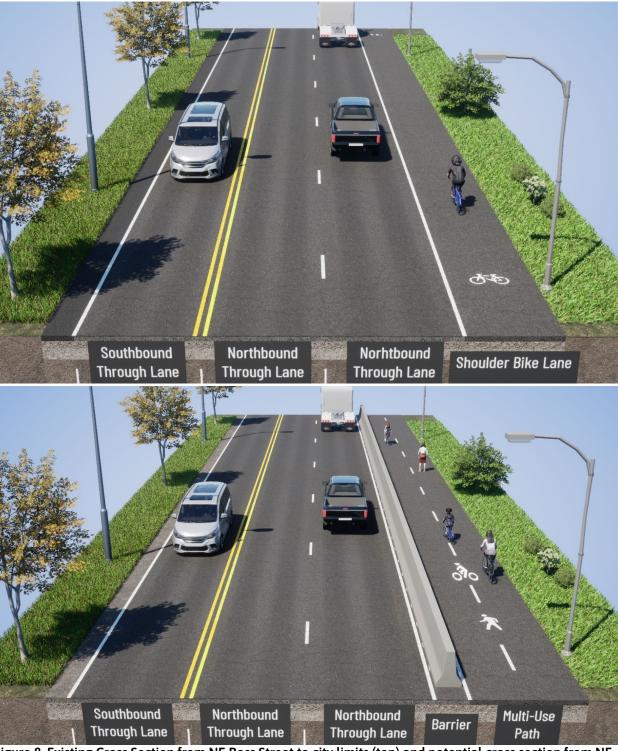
Existing Cross Section from NE Ross Street to city limits (top) and potential cross section from NE Ross Street to city limits (bottom)
